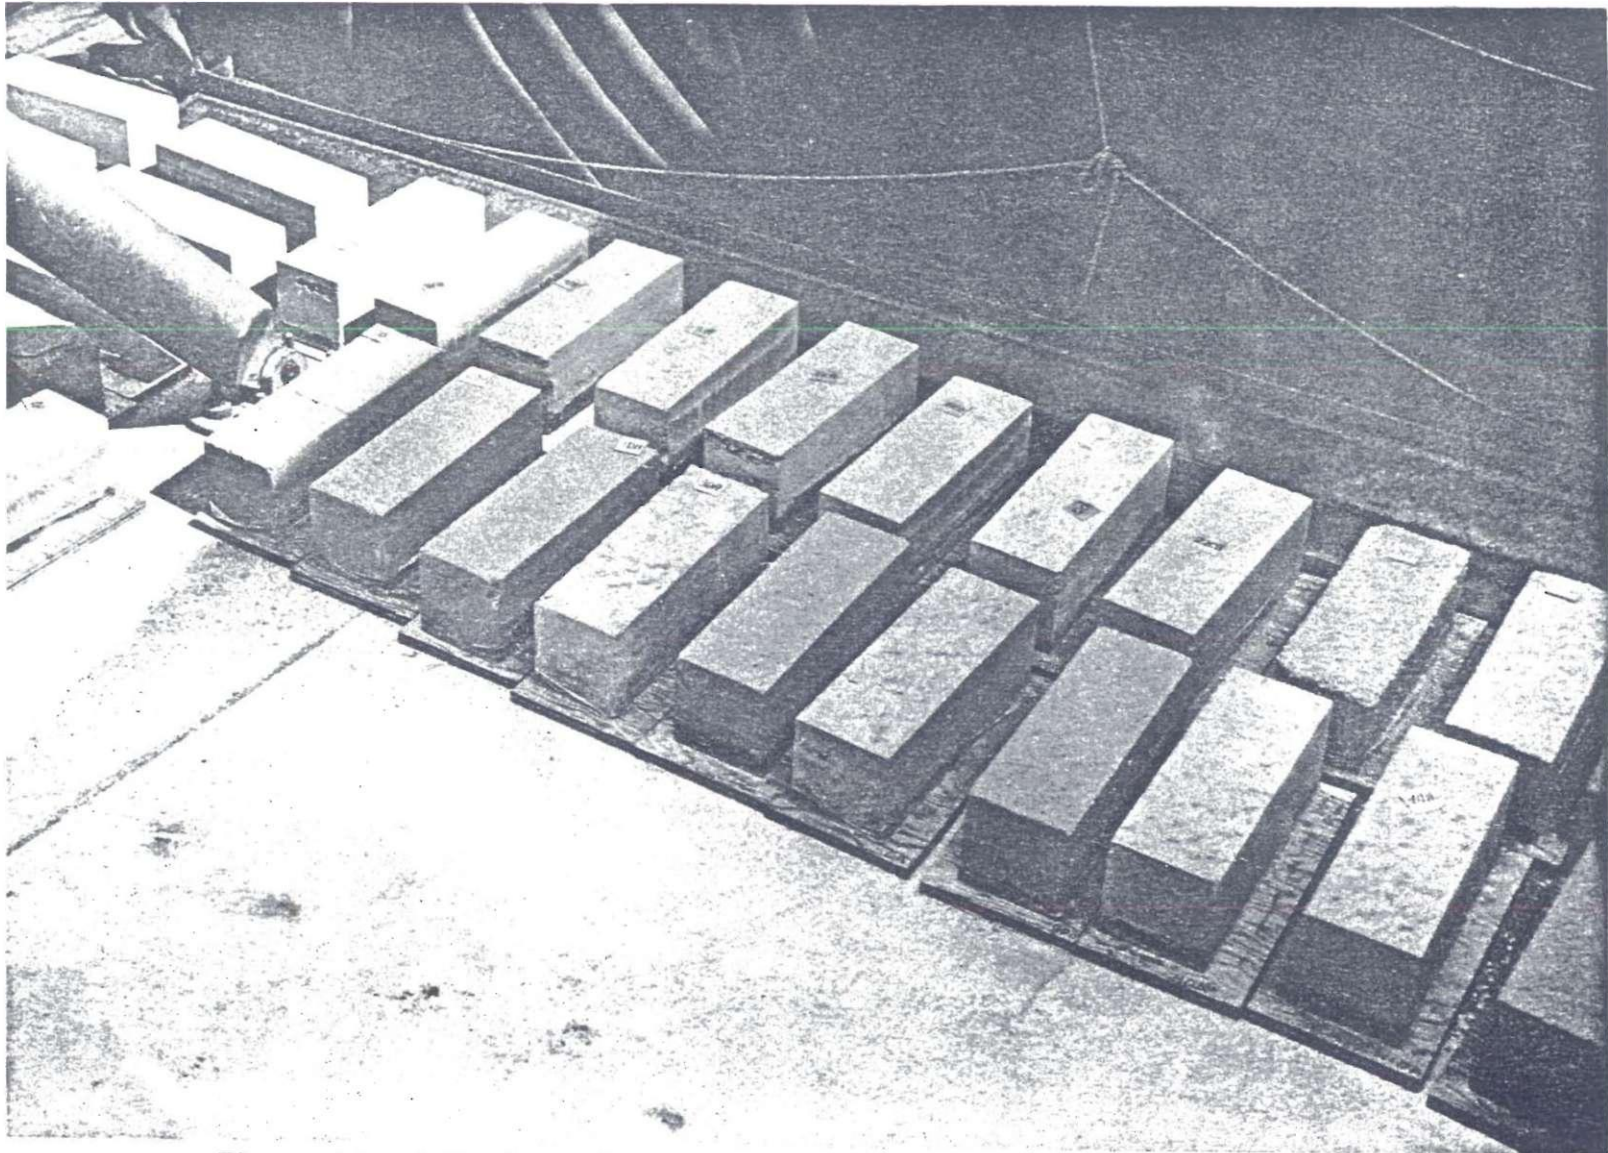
Soils C and D Specimens Being Subjected to Outside Exposure.
